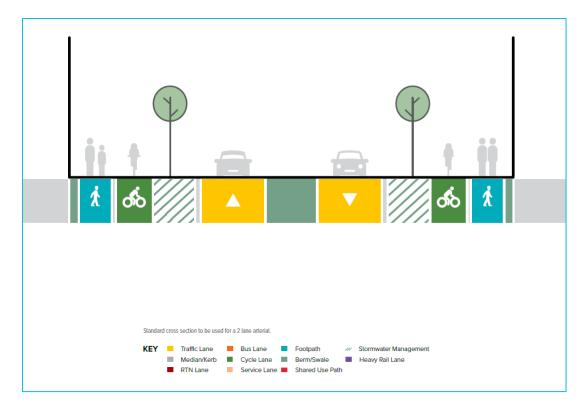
Generic Two-Lane Arterial - 24m cross section with 2 lanes for general traffic and active transport facilities either side. Proposed south of Burtt Road (not to scale)
